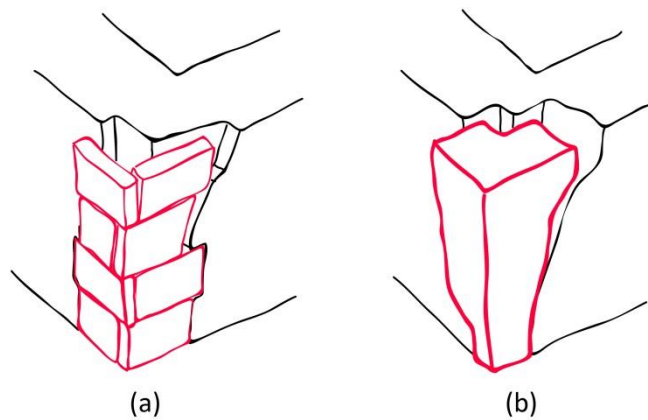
The stone blocks at the wall connections can be: (a) only decorative elements; or (b) only superficial (adapted from Doglioni 2007)
